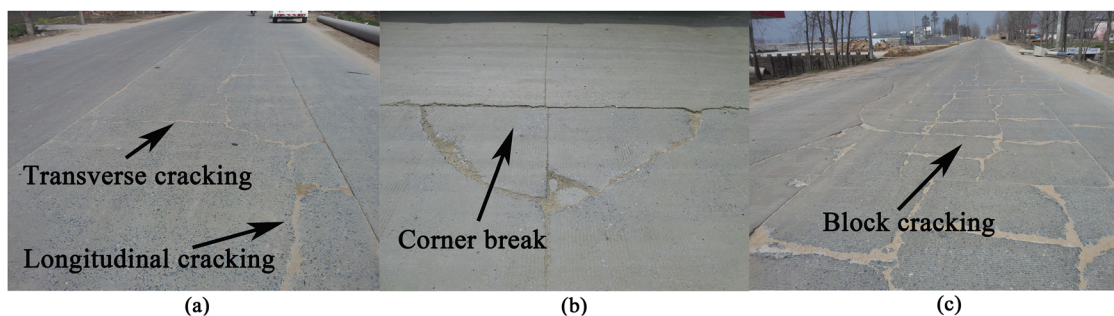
Pavement distress. (a) Transverse and longitudinal cracking. (b) Corner break. (c) Blocking cracking.
